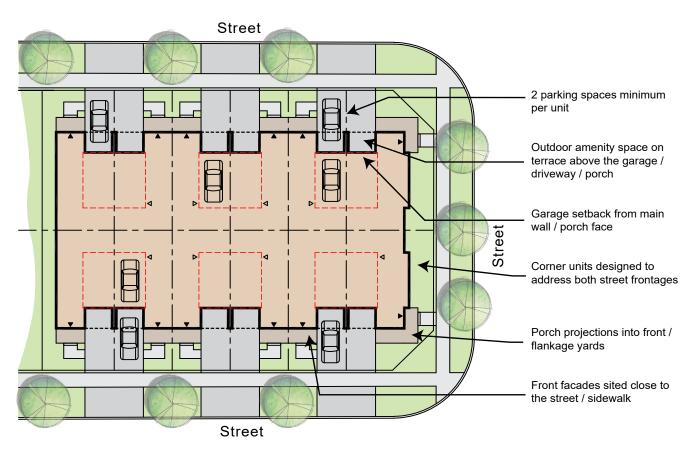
Conceptual Demonstration Site Plan For Back-to-Back Townhouses
